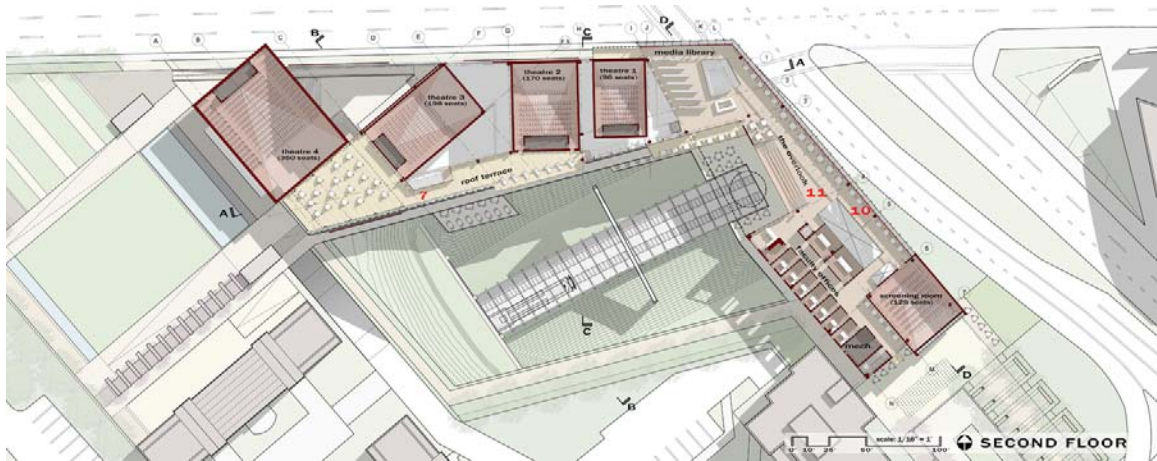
Second Floor, Roof terrace shown as well as full seating layout for theatres
